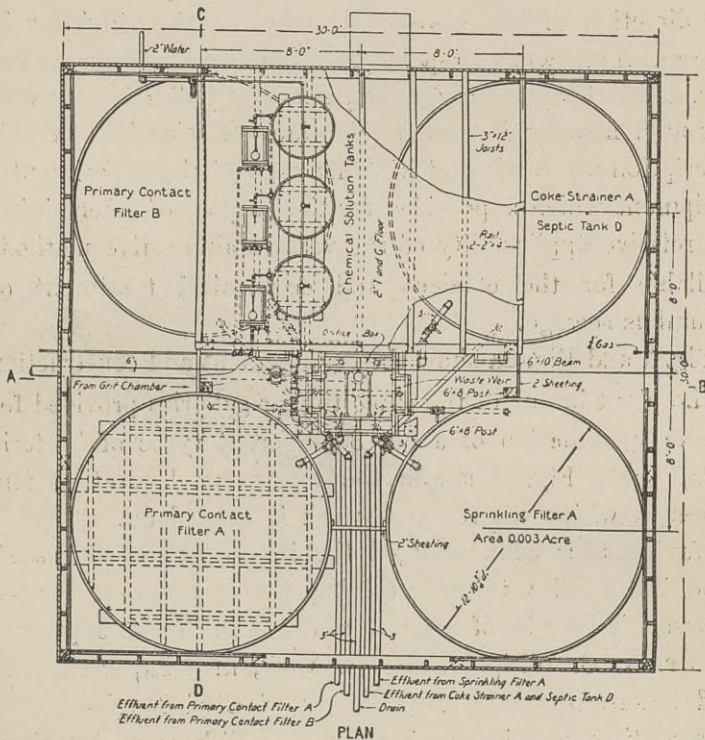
Sewage Testing Station at Columbus, Ohio, U.S.A.
